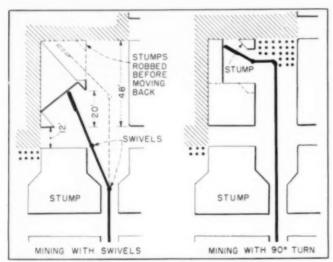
FIG. I-STANDARD PILLAR-MINING PLANS used at Hawk's Nest.
